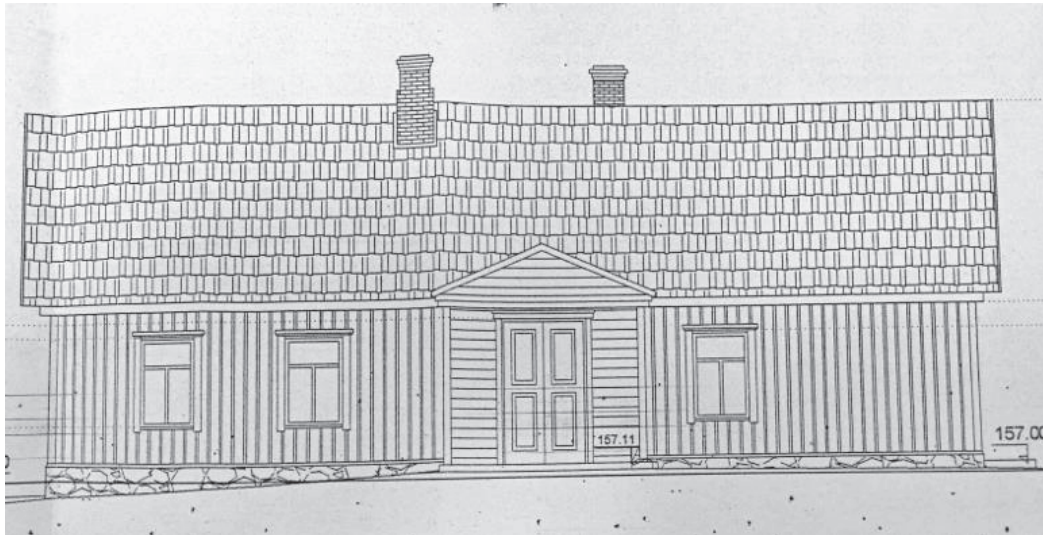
The southern façade of the redesigned residential house with a proposedly reconstructed enclosed veranda (The Reconstruction of the Individual Residential House, 2007. Trakai Historical National Park).
